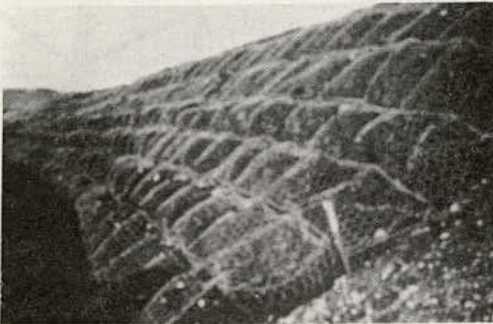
Wall to contain fill at bridge abutment on the Snoqualmie Pass.
